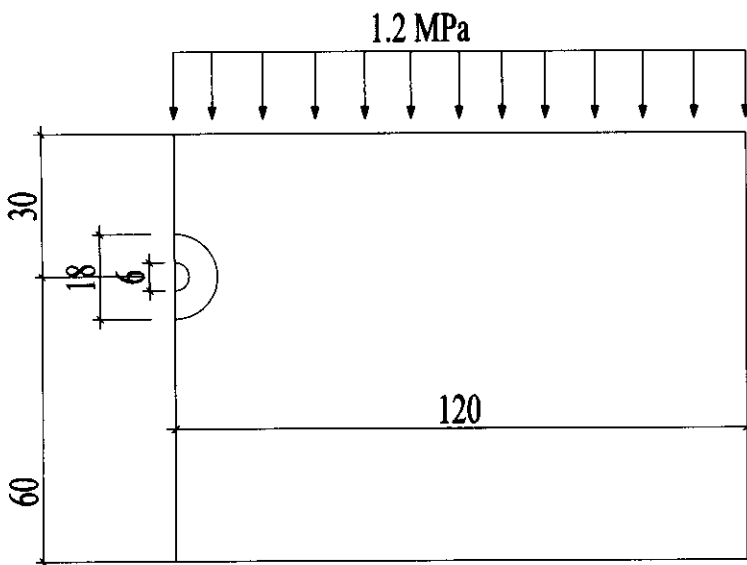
Cross-section of tunnel model at 80m depth (unit: m).
